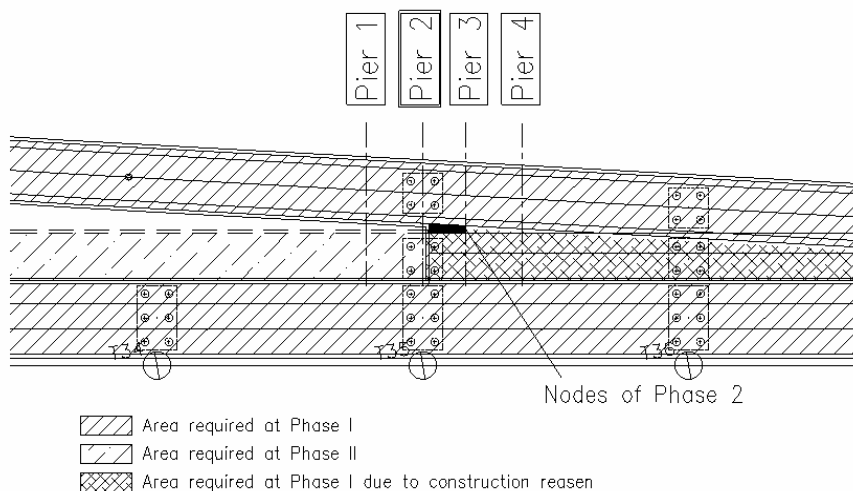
Arrangement of Node Point and Design Section of Bridge
